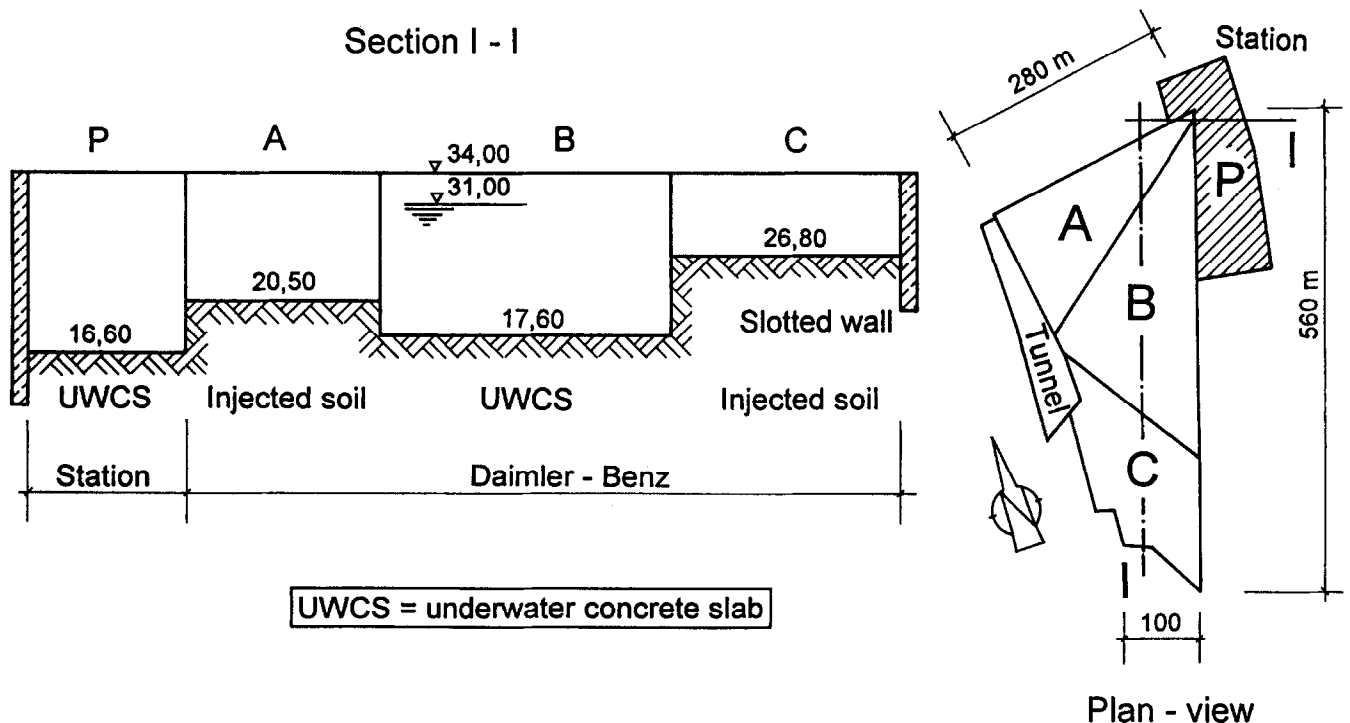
Section through the building pit 'Potsdamer Platz'.
